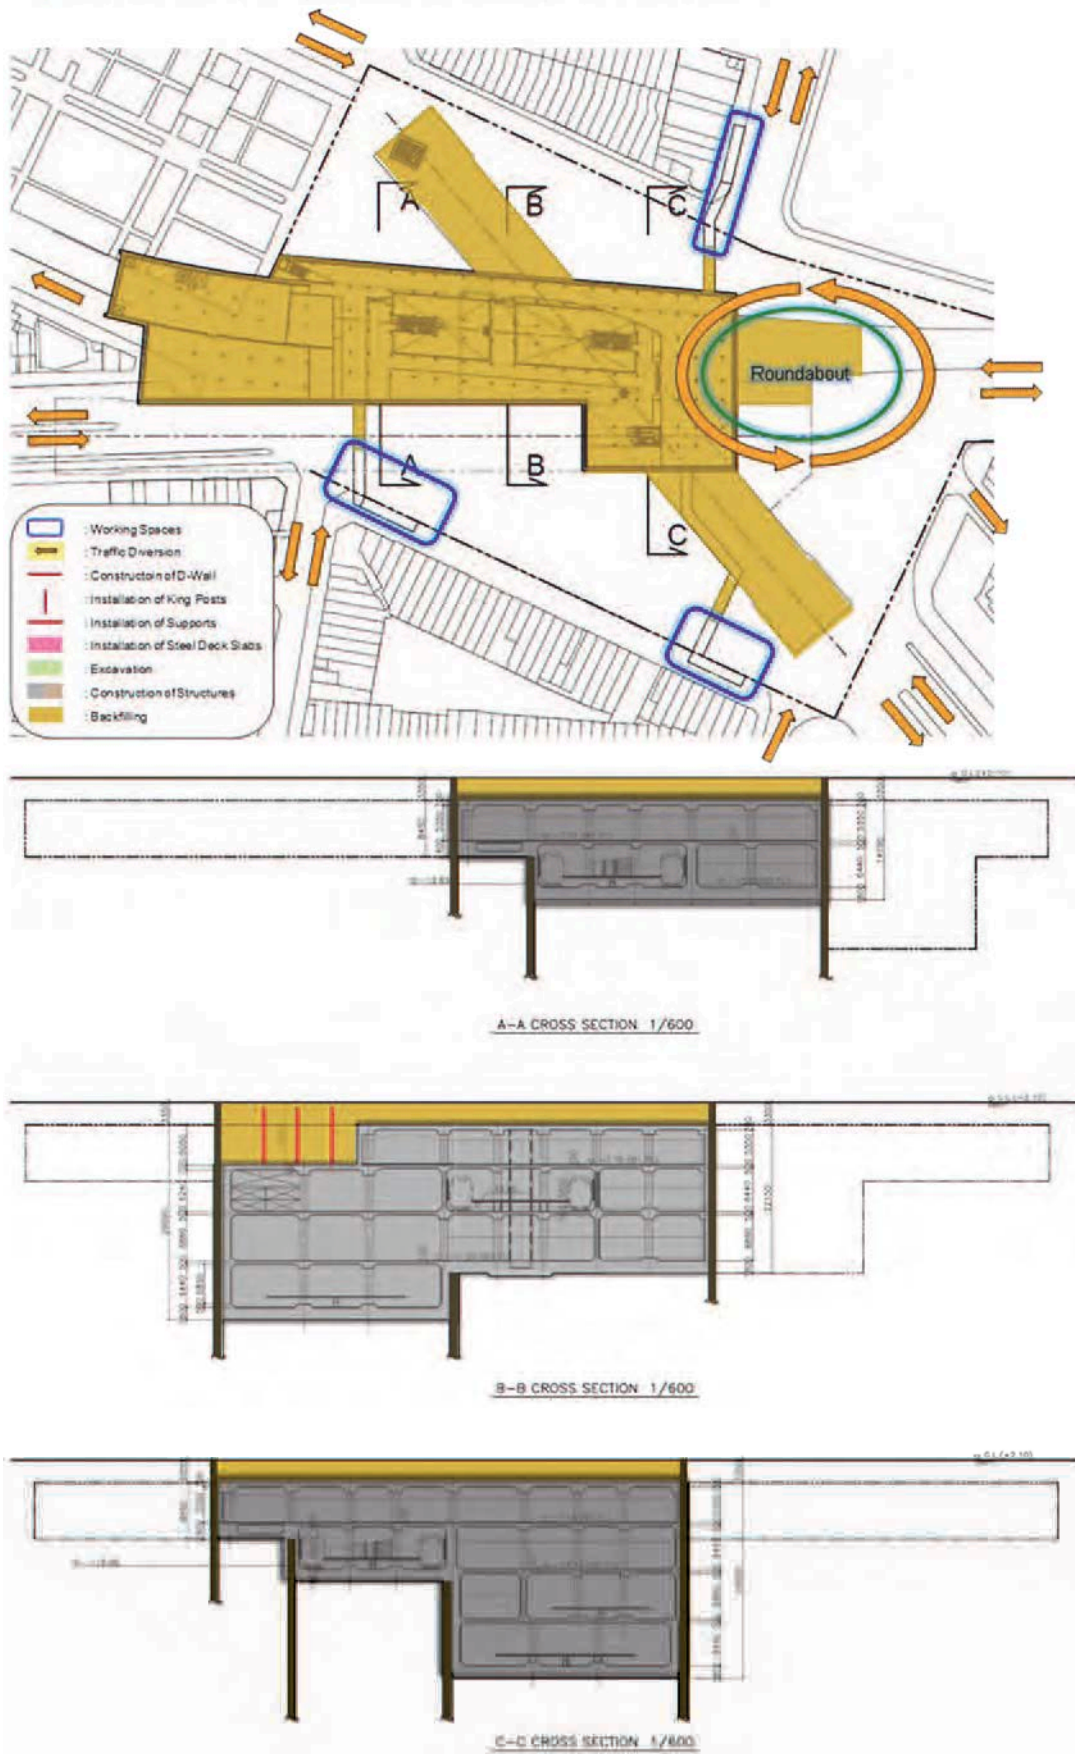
Construction Sequences of Ben Thanh Central Station (8/24)
